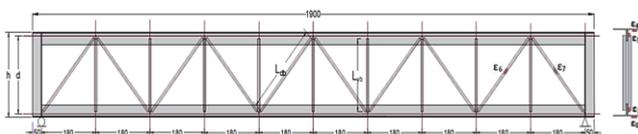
Prefabricated Hybrid Open Web Steel Joists (all dimensions in mm).
